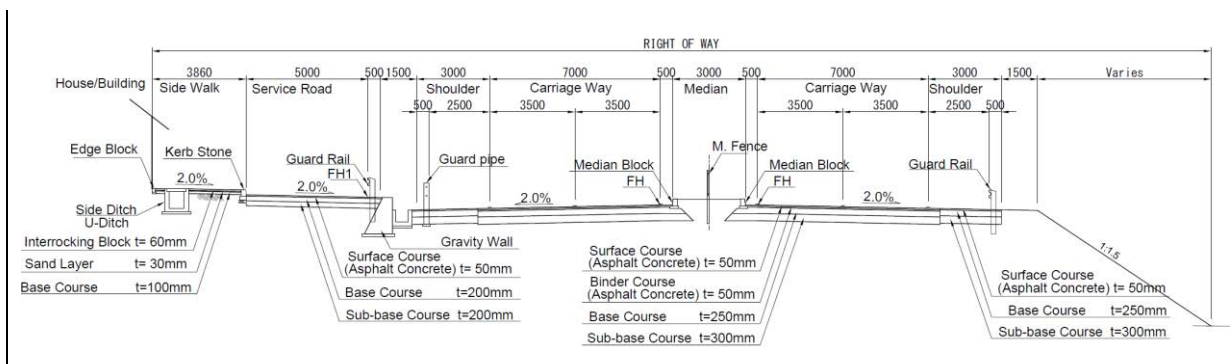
Typical Cross Section (Dhulikhel Built-up Area)
